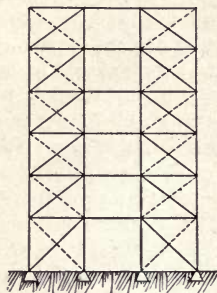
Diagonal Wind Bracing in Tall Buildings
